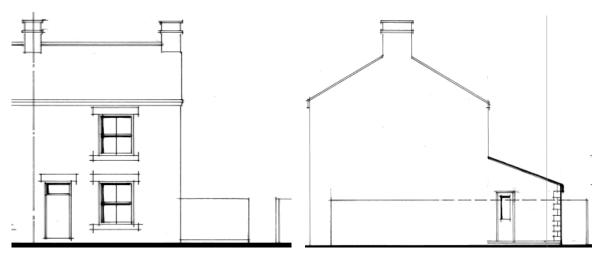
Proposed Front Elevation (top left), Proposed Side Elevation facing No.5 Chapel Fields (top right).
